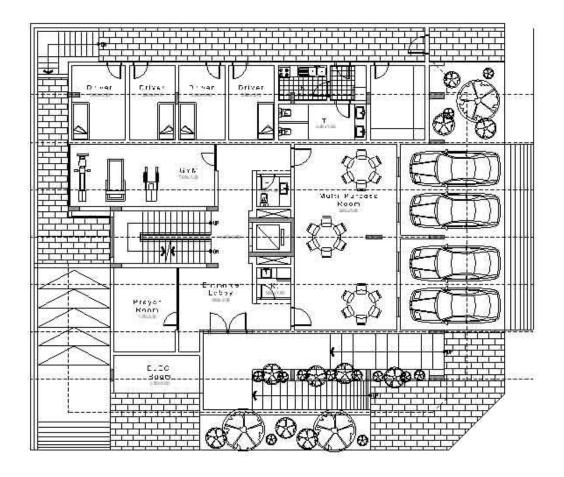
A floor plan of the ground floor of the building. The architect designed this floor to serve as a service and communal space. He provided social spaces which the brothers cannot accommodate within their apartments. These spaces and rooms would usually be found within a large villa or a courtyard home. The design of this floor features a praying room, a multipurpose room and a gym. Also, it accommodates rooms and service areas for people working for the owners, such as drivers and the housekeeper.
